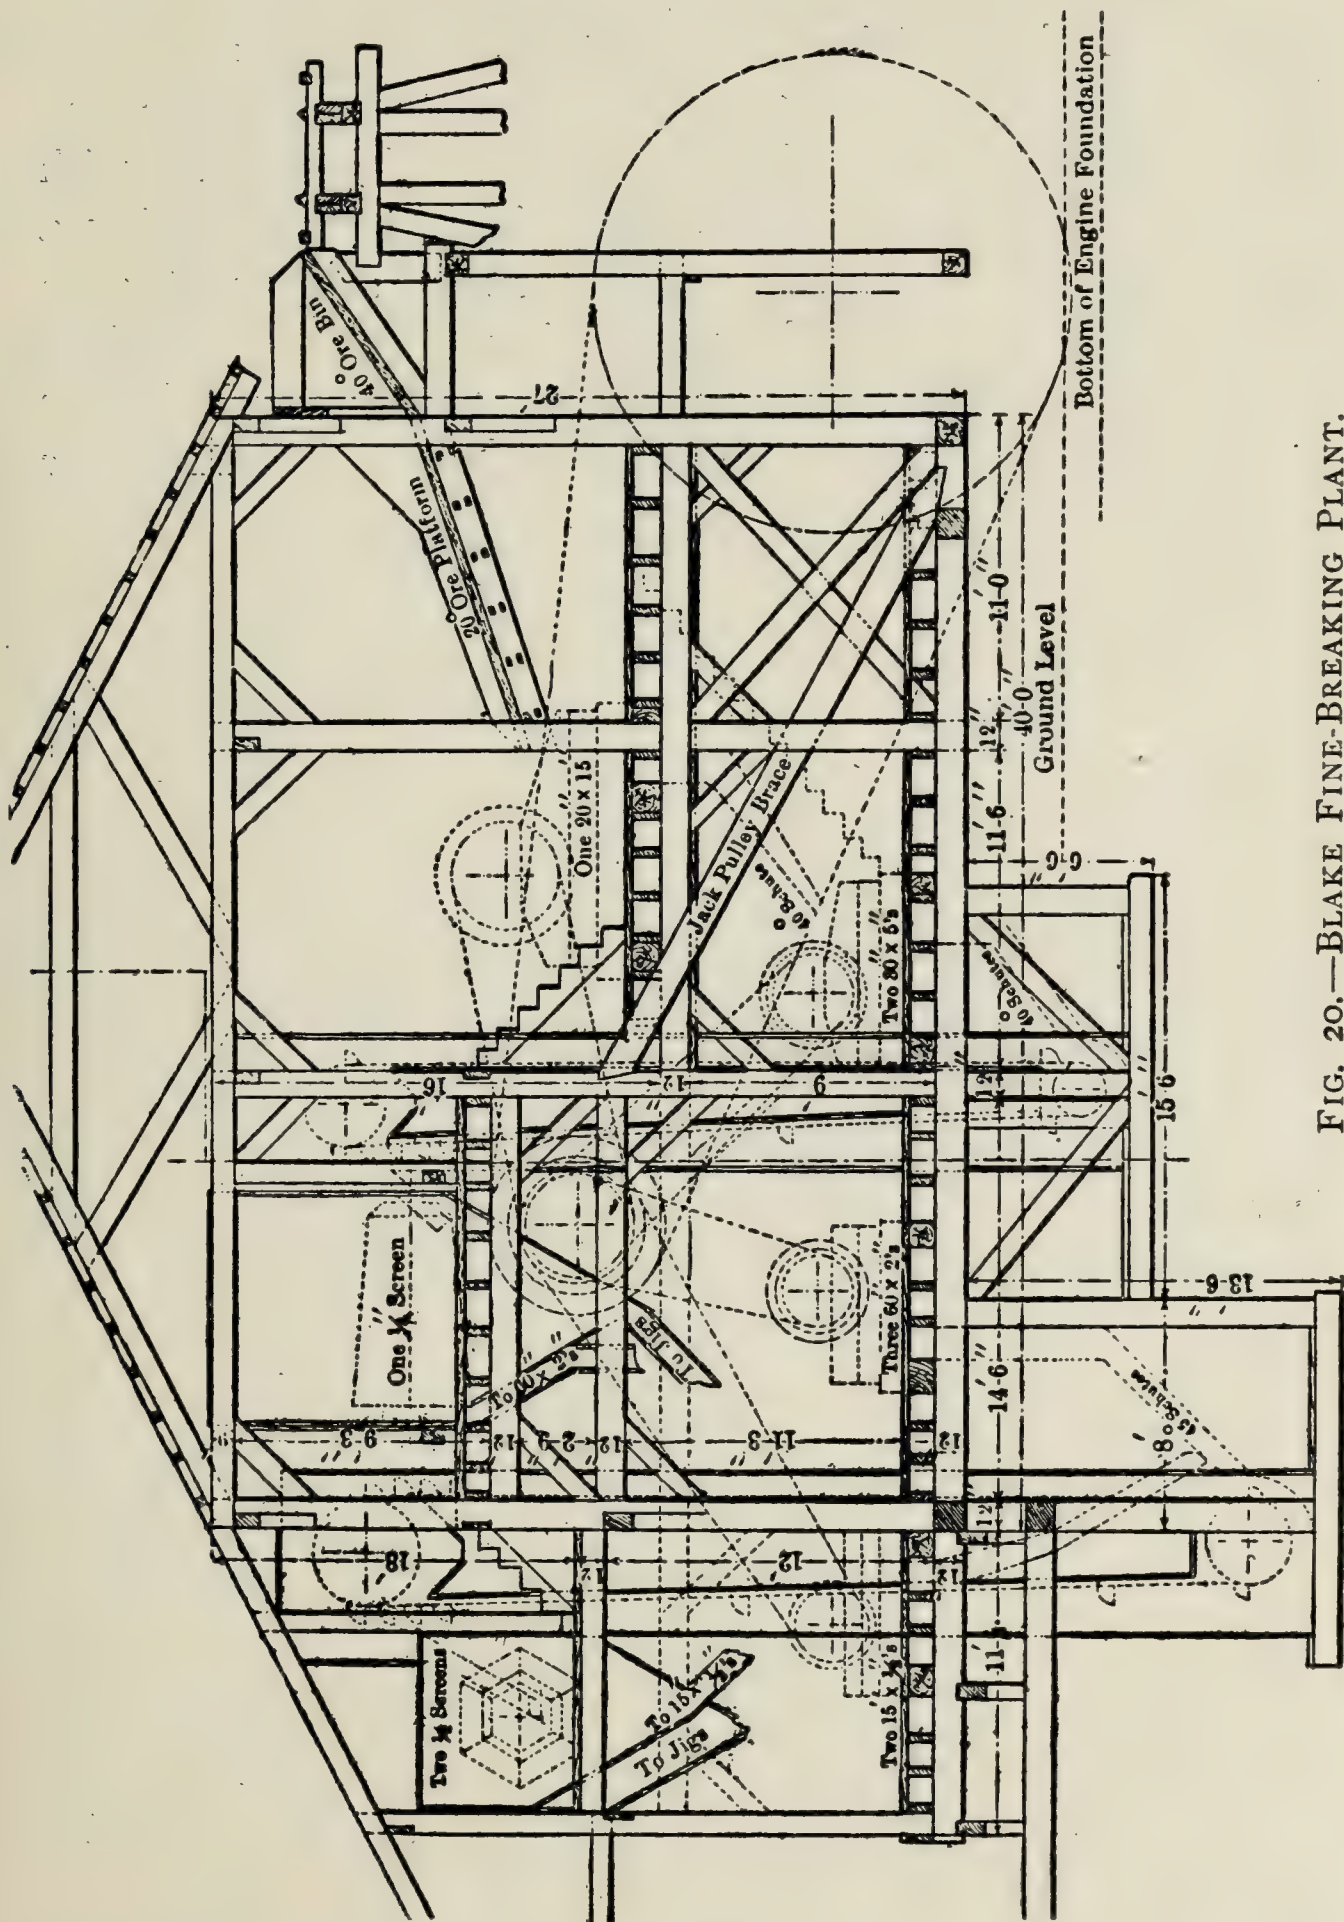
BLAKE FINE-BREAKING PLANT.
